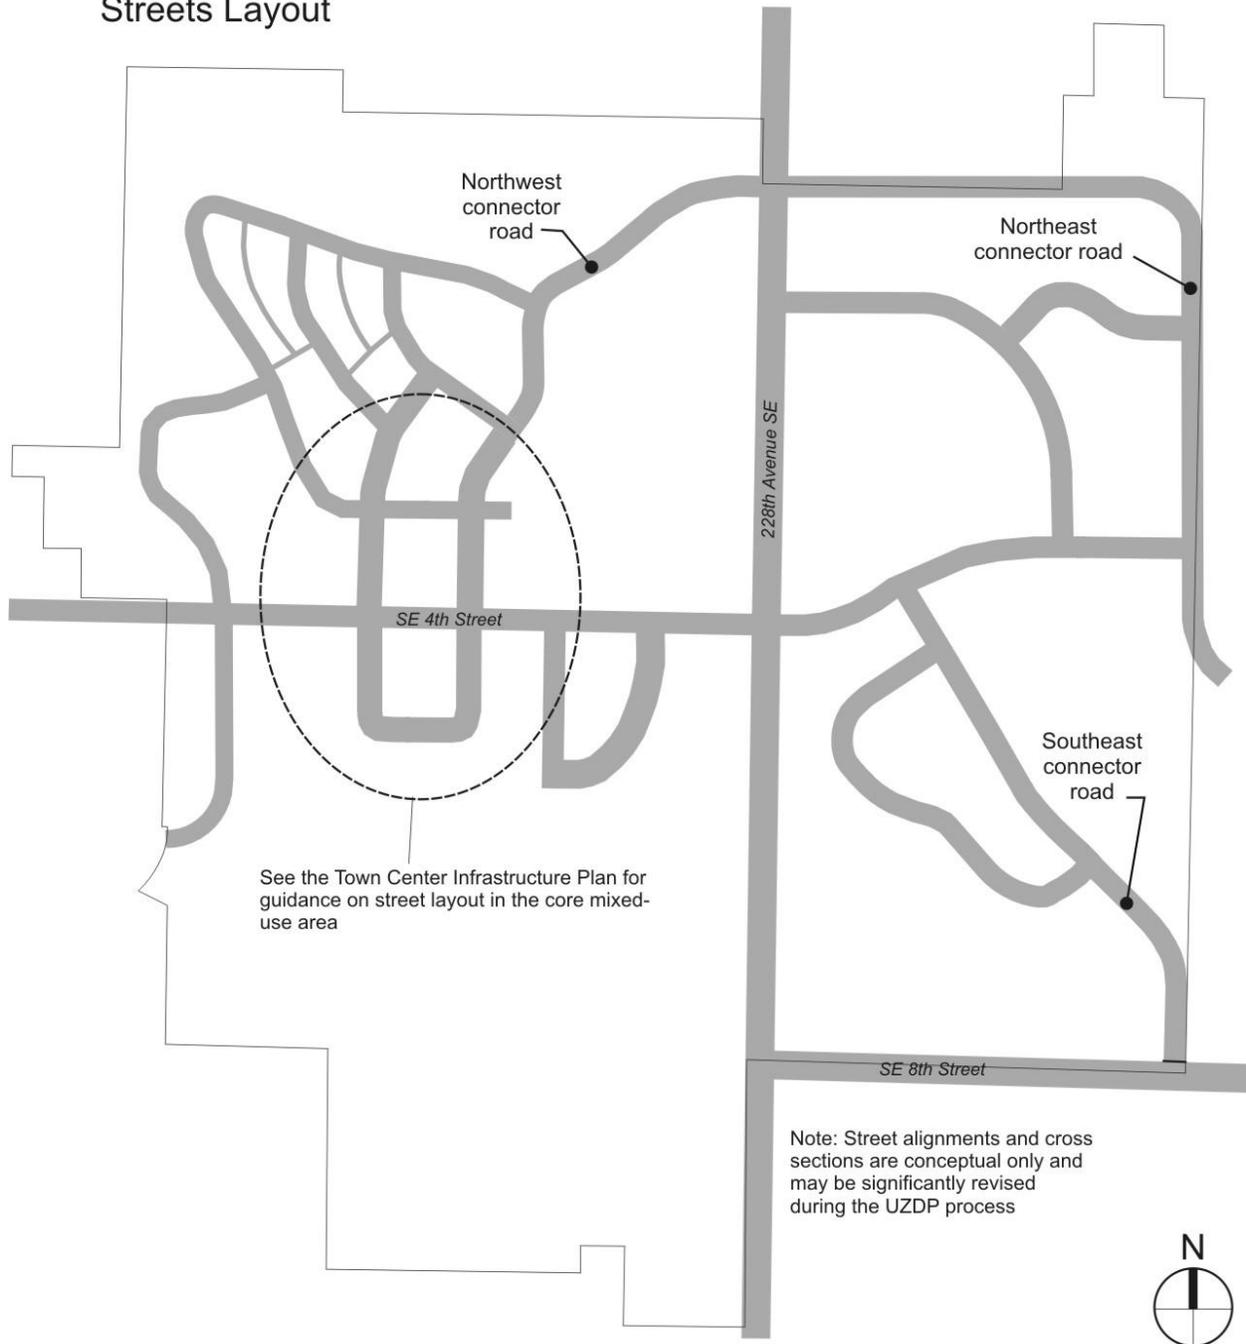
B.30.110a. A desirable configuration of connected public and private streets and alleys in the Town Center. Also see the Town Center Infrastructure Plan for more guidance on the street layout for the areas west of 228th Avenue SE
